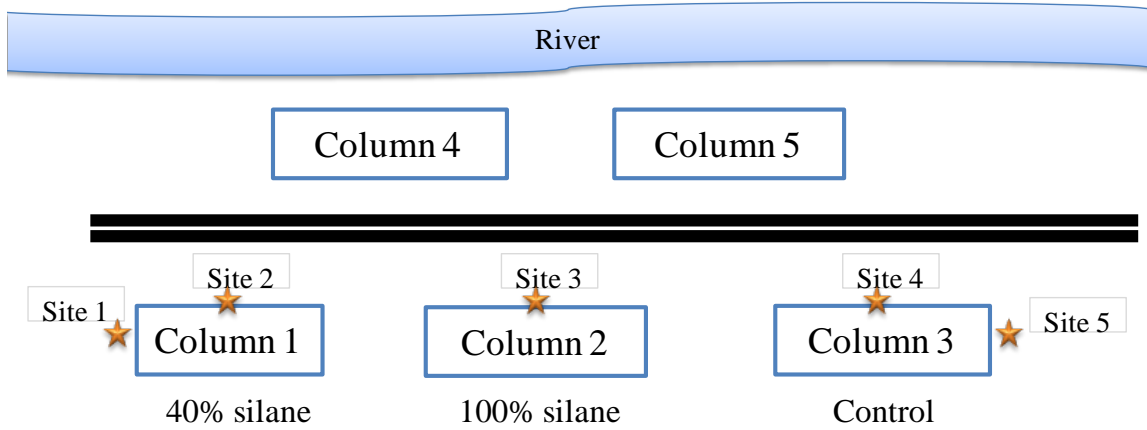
Treatment and monitoring plans for the I-395 bridge over Main Street.
